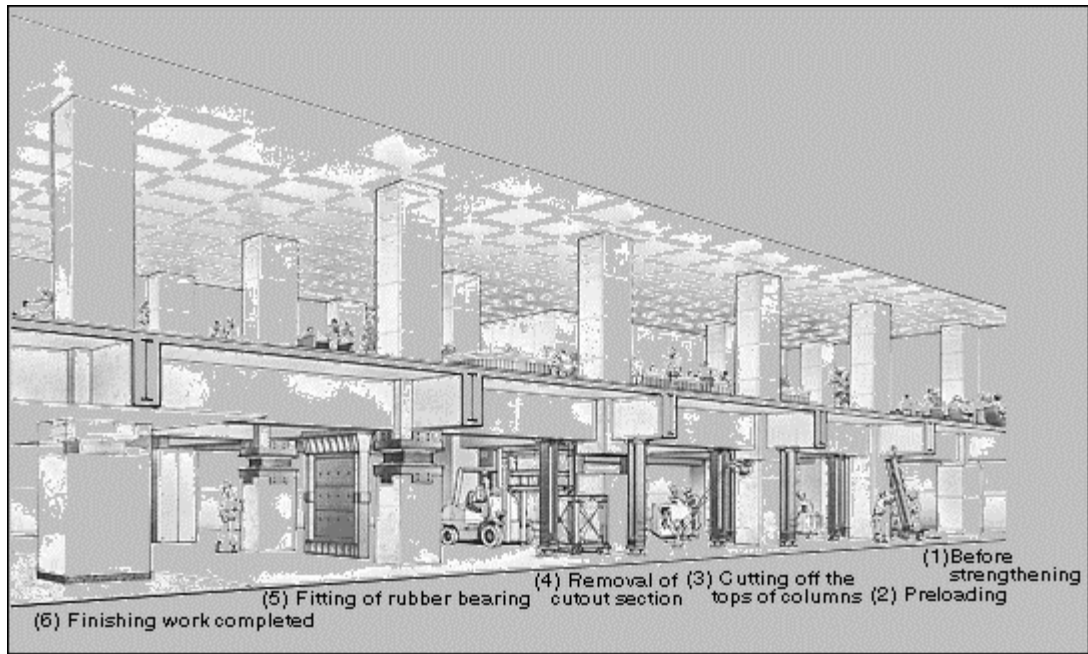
Improvement work on the first floor, Second floor and above area business as usual
